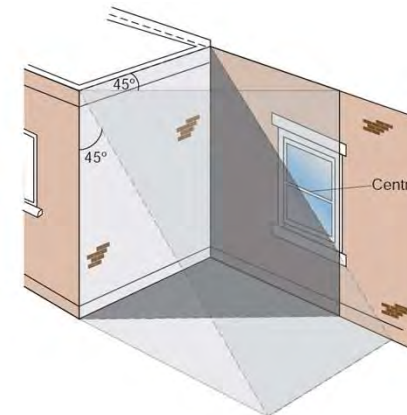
45° Approach (BRE 'Site Layout Planning for Daylight and Sunlight' 2011)
